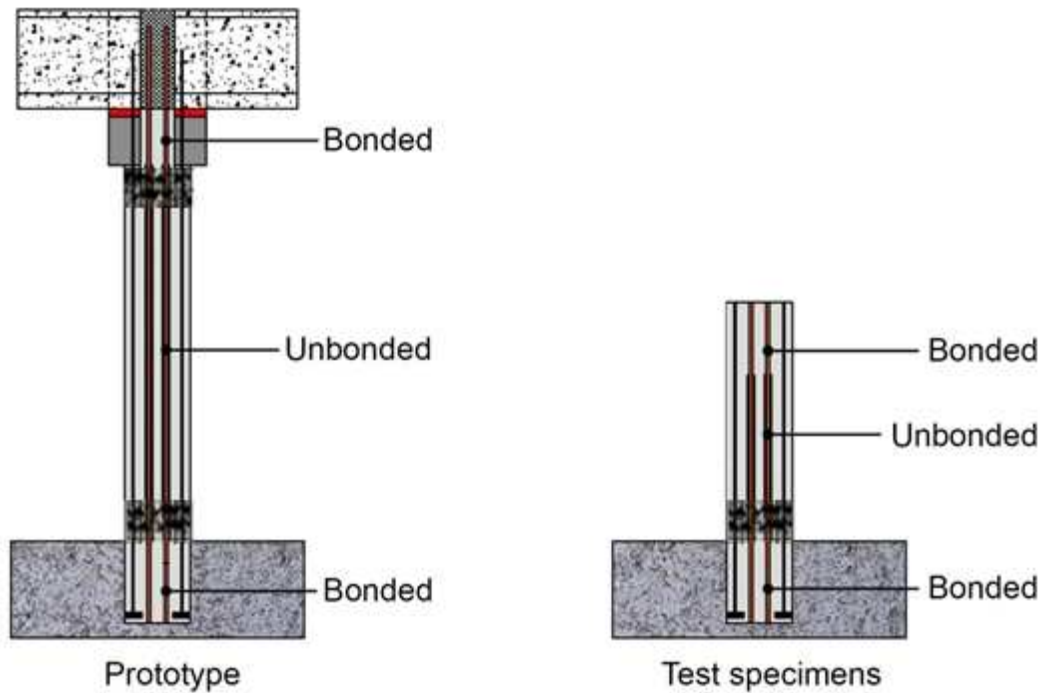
Elevation view of the specimen PreT-SF-ROCK-HyFRC.
